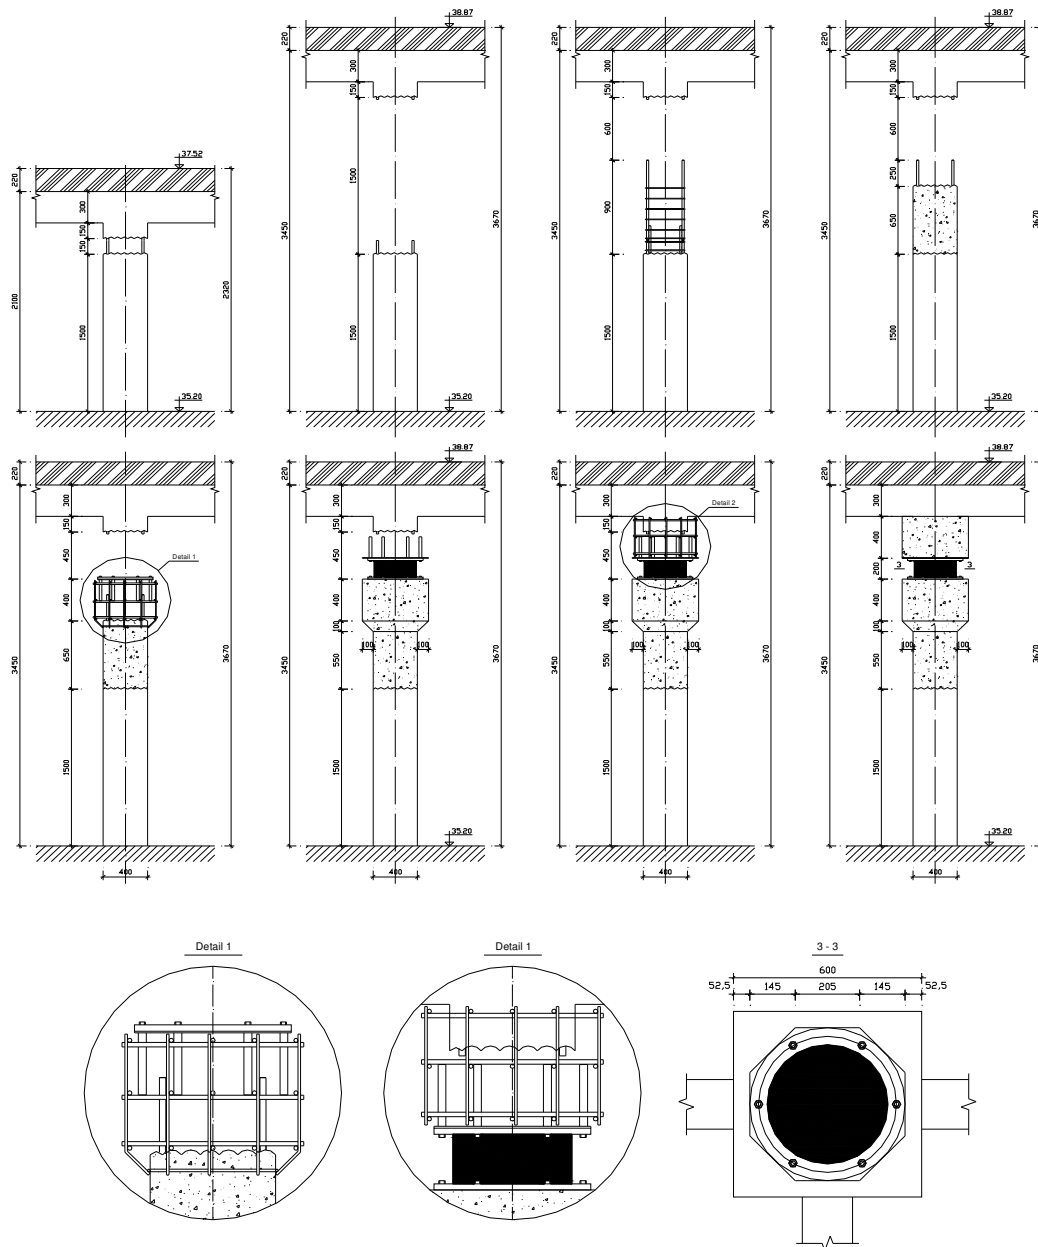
Sequence of placing the rubber bearings in the columns of attic of the existing 12-story office building with R/C bearing frames and shear walls
